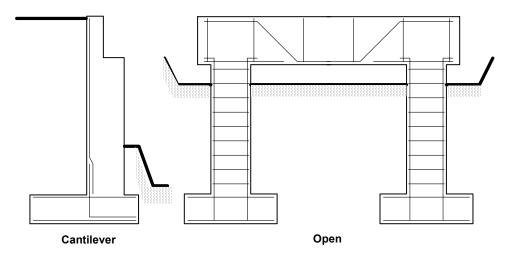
Primary Reinforcing Steel in Abutments
